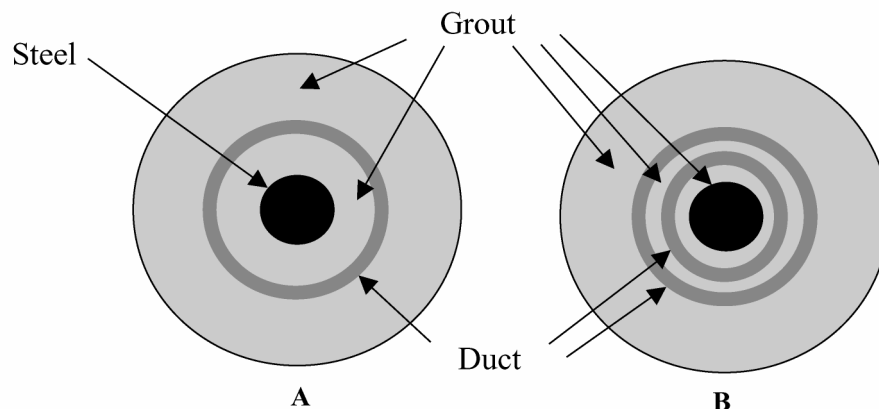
Single and double corrosion protection for a nail using impermeable ducts and grout
